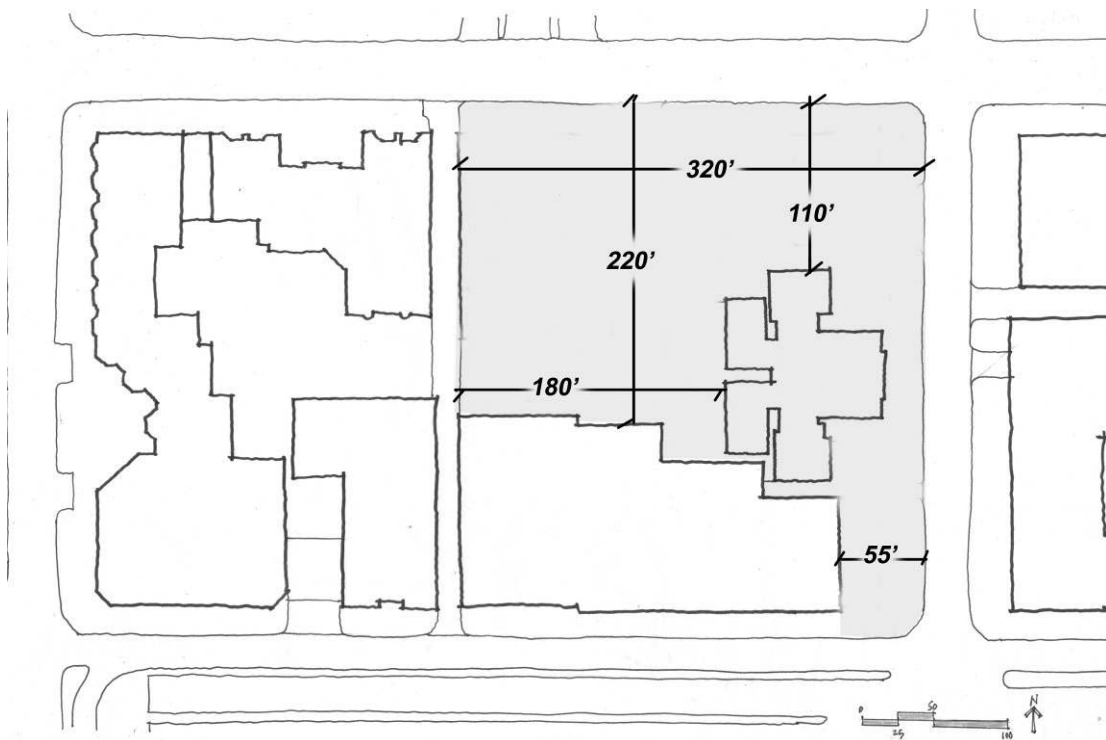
Diagram showing the site dimensions from inside edges to the sidewalk.
